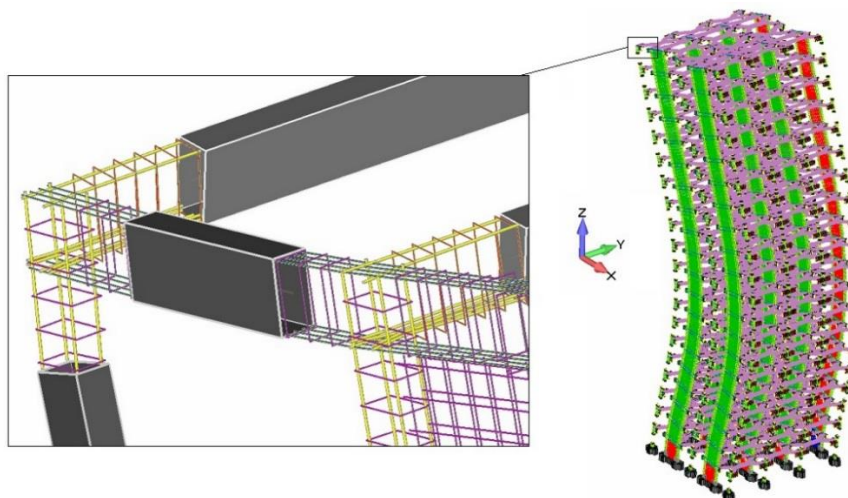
Deformed shape of the embedded rebar elements of the modified 20-storey model with shear walls. Mode 4.
